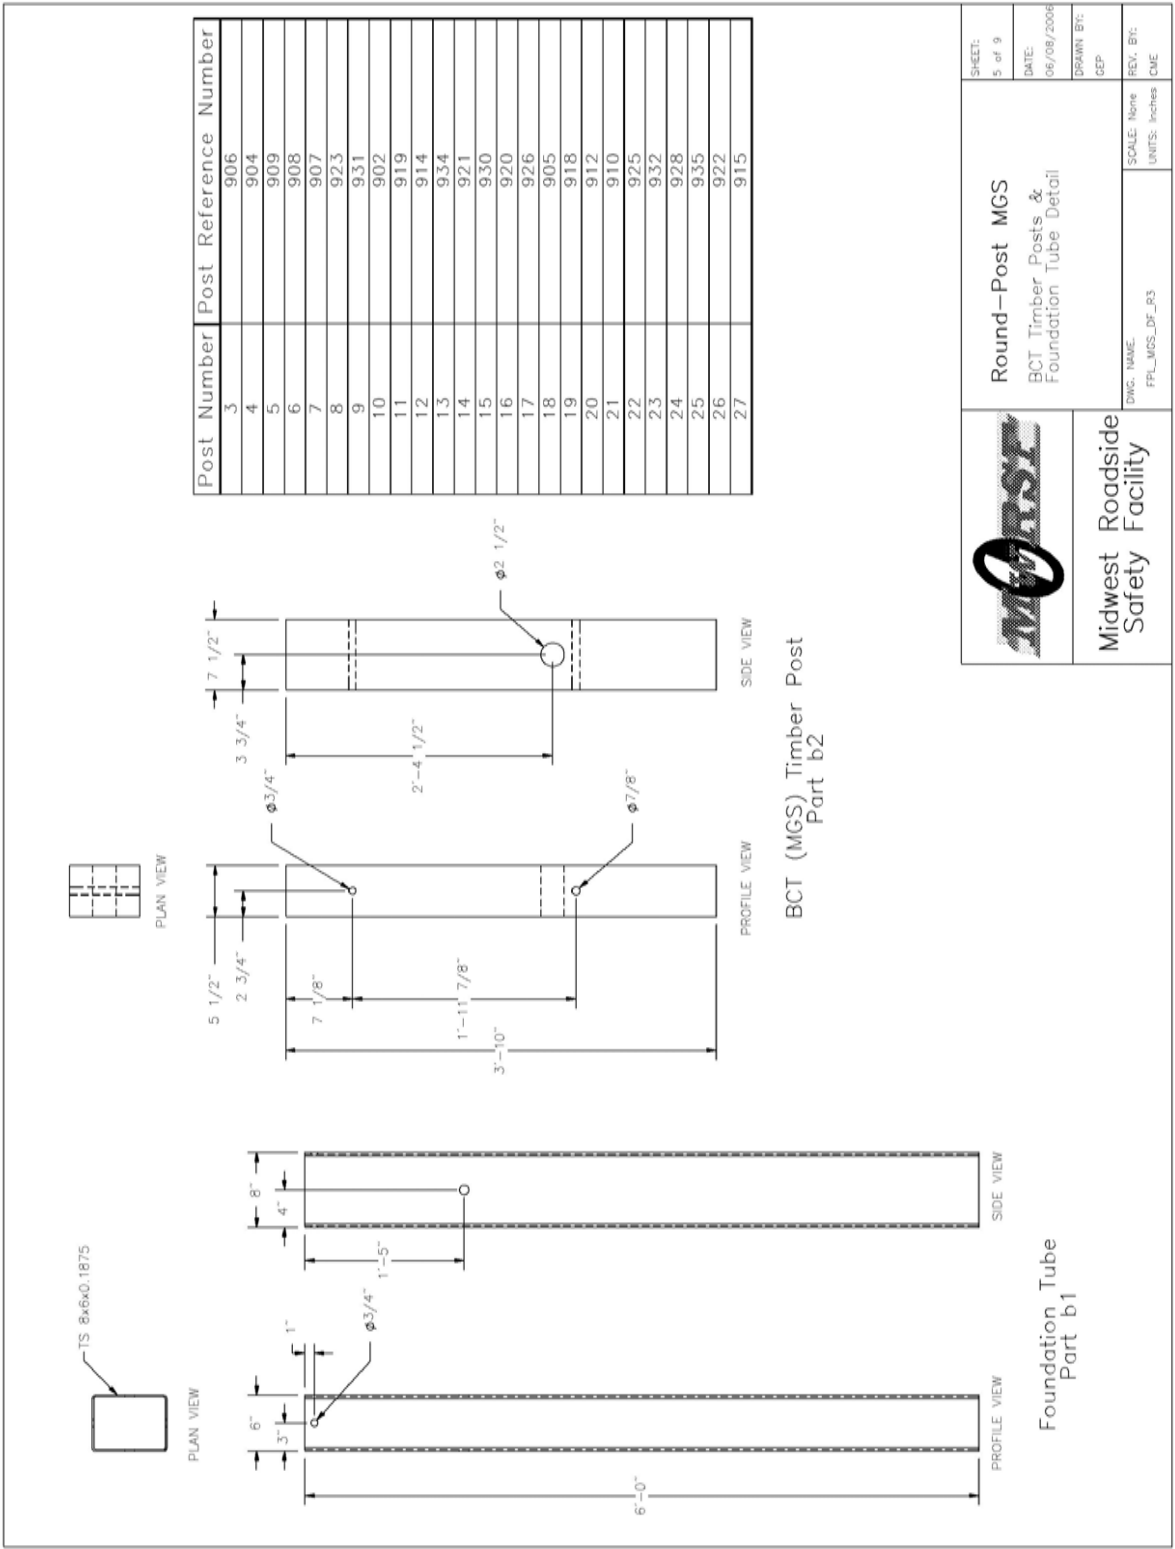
MGS Round Post Douglas Fir English Details – Anchor Post Detail
